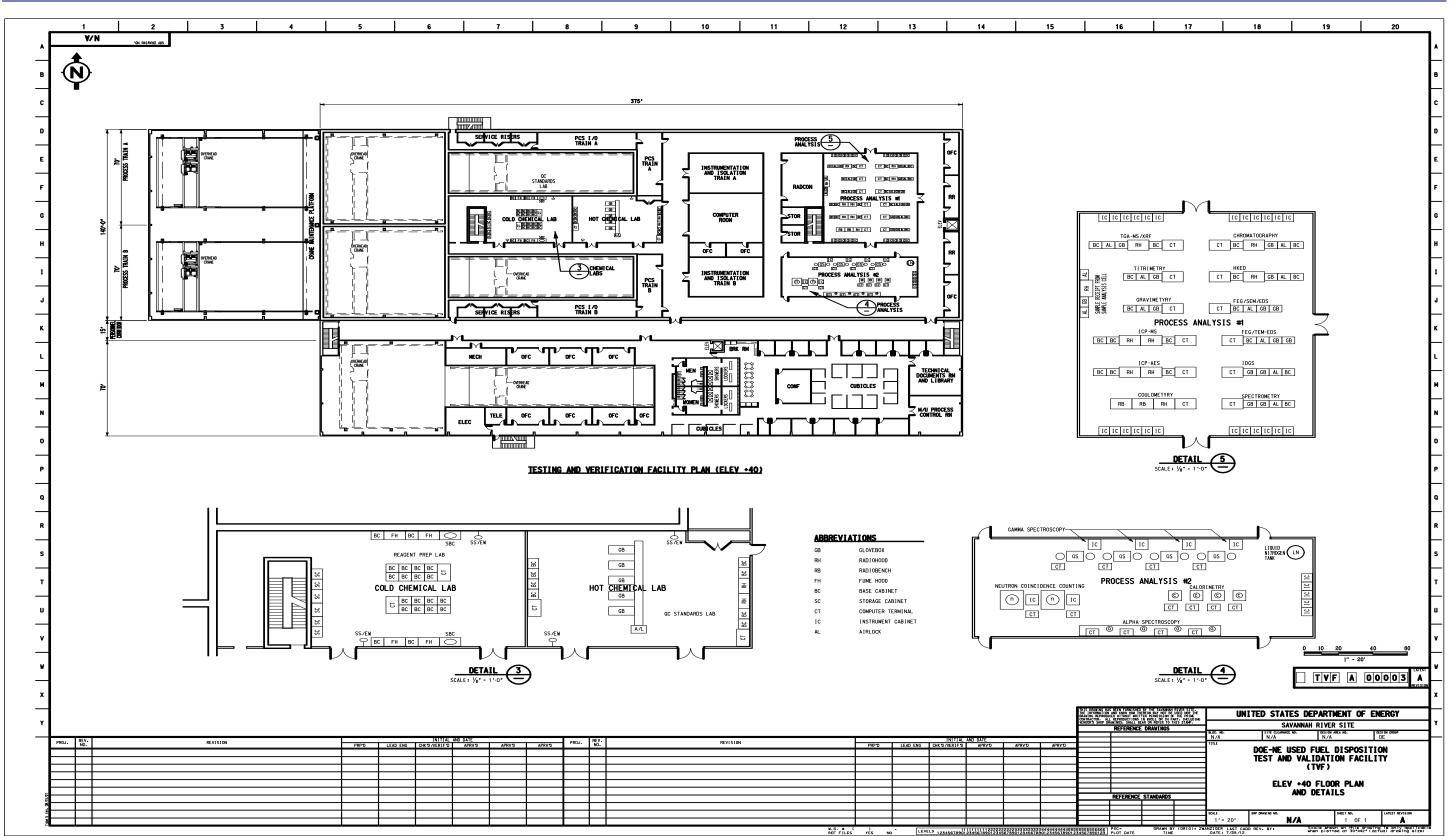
Test and Validation Facility Elevation + 40 Feet
